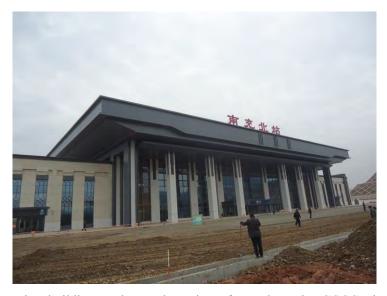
The main station building at the north station of Nanchong by CCCC First Highway Engineering Company Ltd. has been built.
